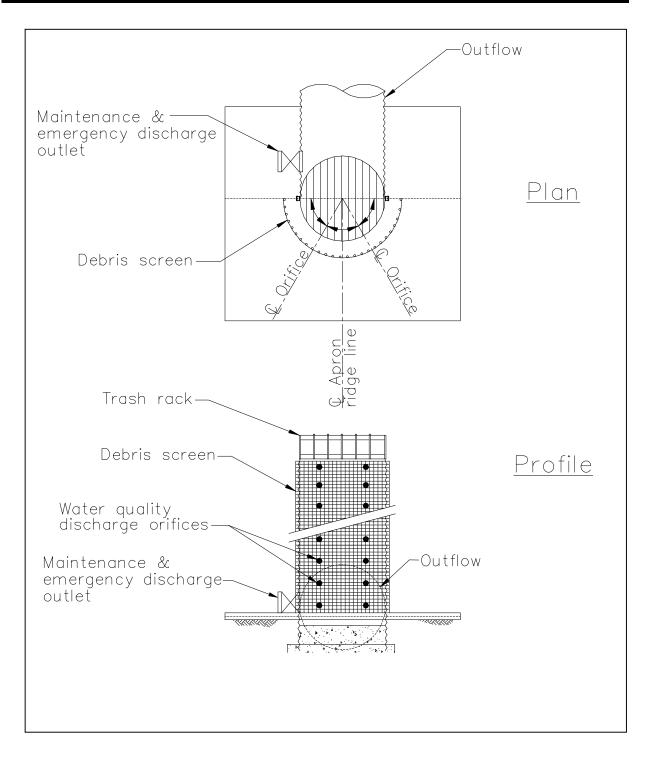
MULTIPLE ORIFICE OUTLET RISER NOT TO SCALE
